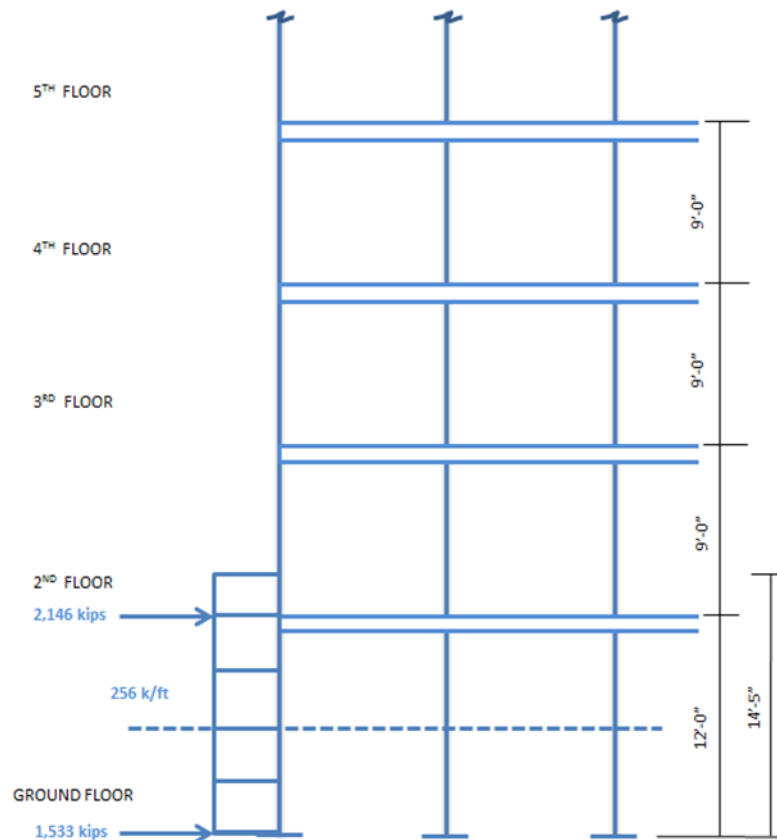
LC2 Tsunami loads on overall Monterey Residential building
